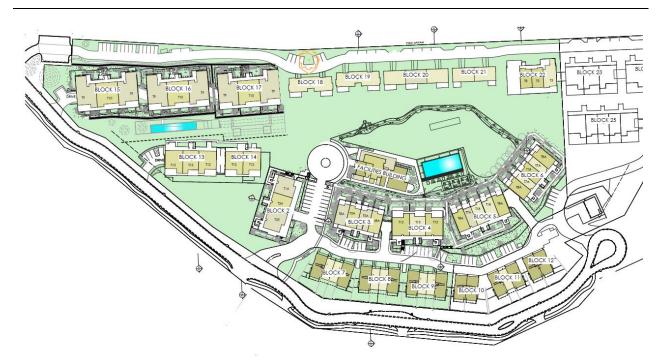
Proposed Layout – Current Change (Revised plan submitted 29.11.2017)
